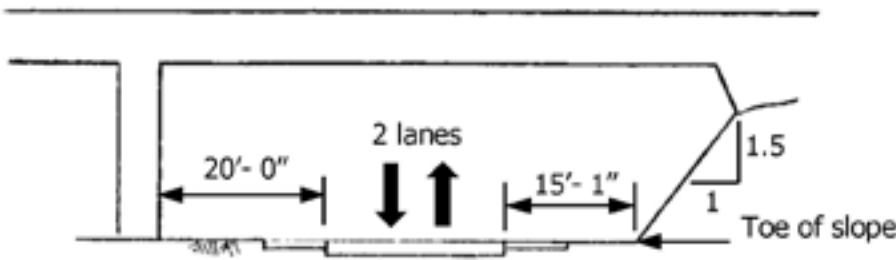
Bridge elevation view of horizontal clearances for a 2-lane highway with 2-way traffic below the bridge.
